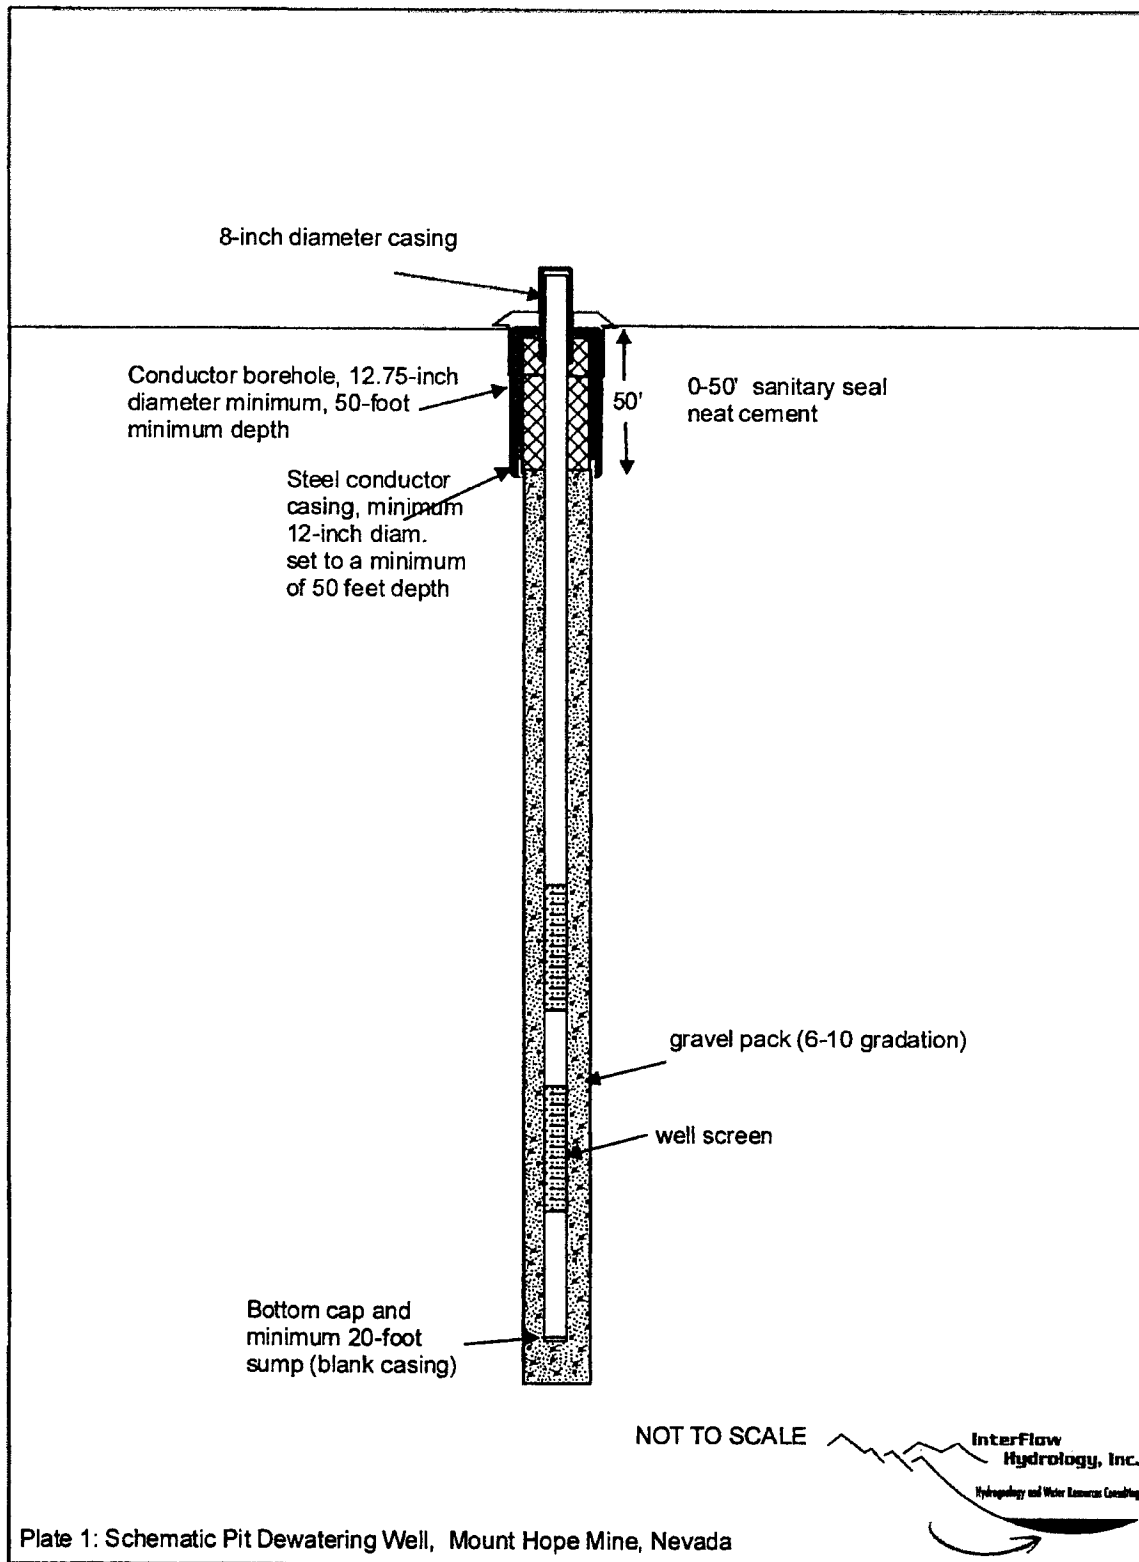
Schematic Pit Dewatering Well, Mount Hope Mine, Nevada
